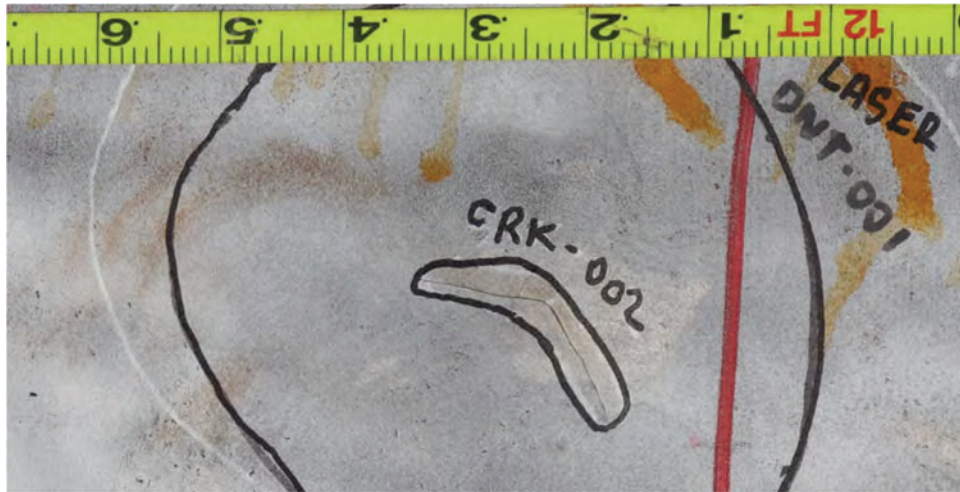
Close-up Photograph of the External Surface of the Pipe Section Containing the Case 4 Dent, Showing a Crack at a Bottomside Dent
